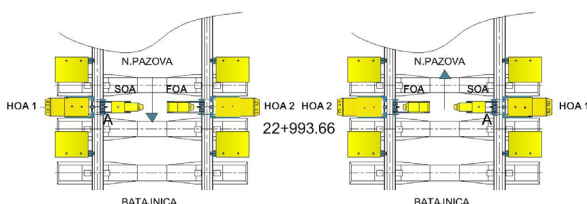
Module 3 of the Batajnica measurement checkpoint
